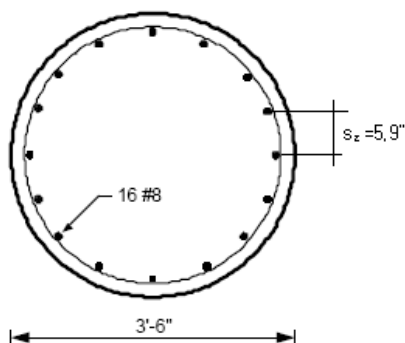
Cross Section of Columns (Modjeski and Masters, Inc.)
